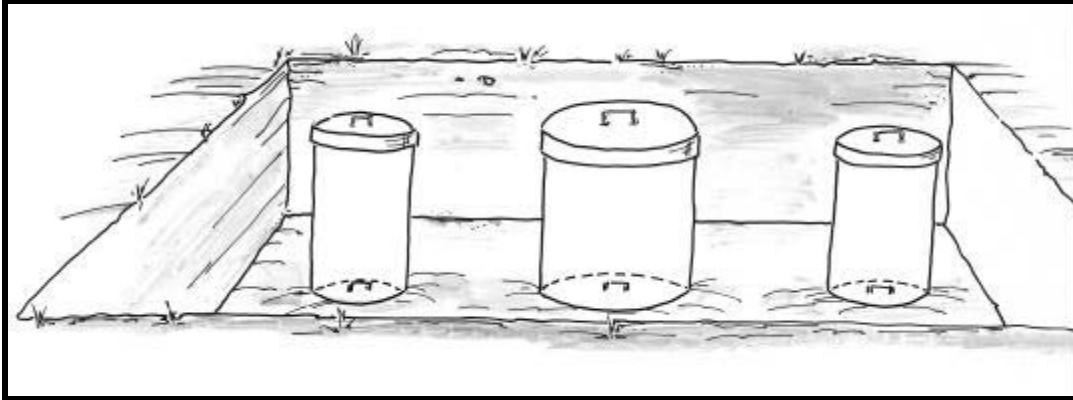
Proper installation of concrete well ring risers on the main access (manhole). Main access (manhole) cover remains on the tank; well rings are capped with a concrete cover that overlaps the outside of the rings to prevent leakage.
